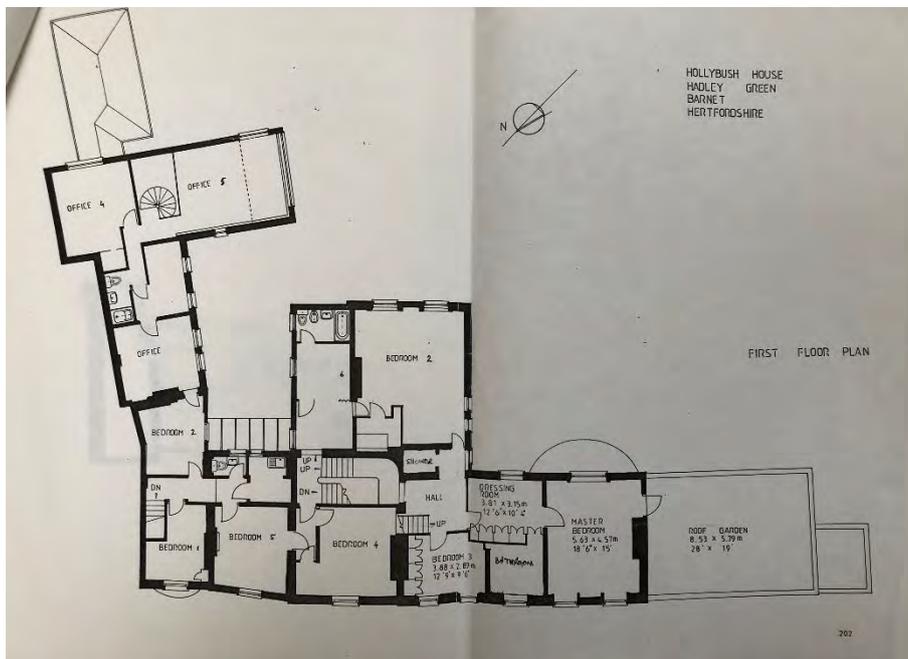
first floor layout of Hollybush House, 20<sup>th</sup> century Private collection
